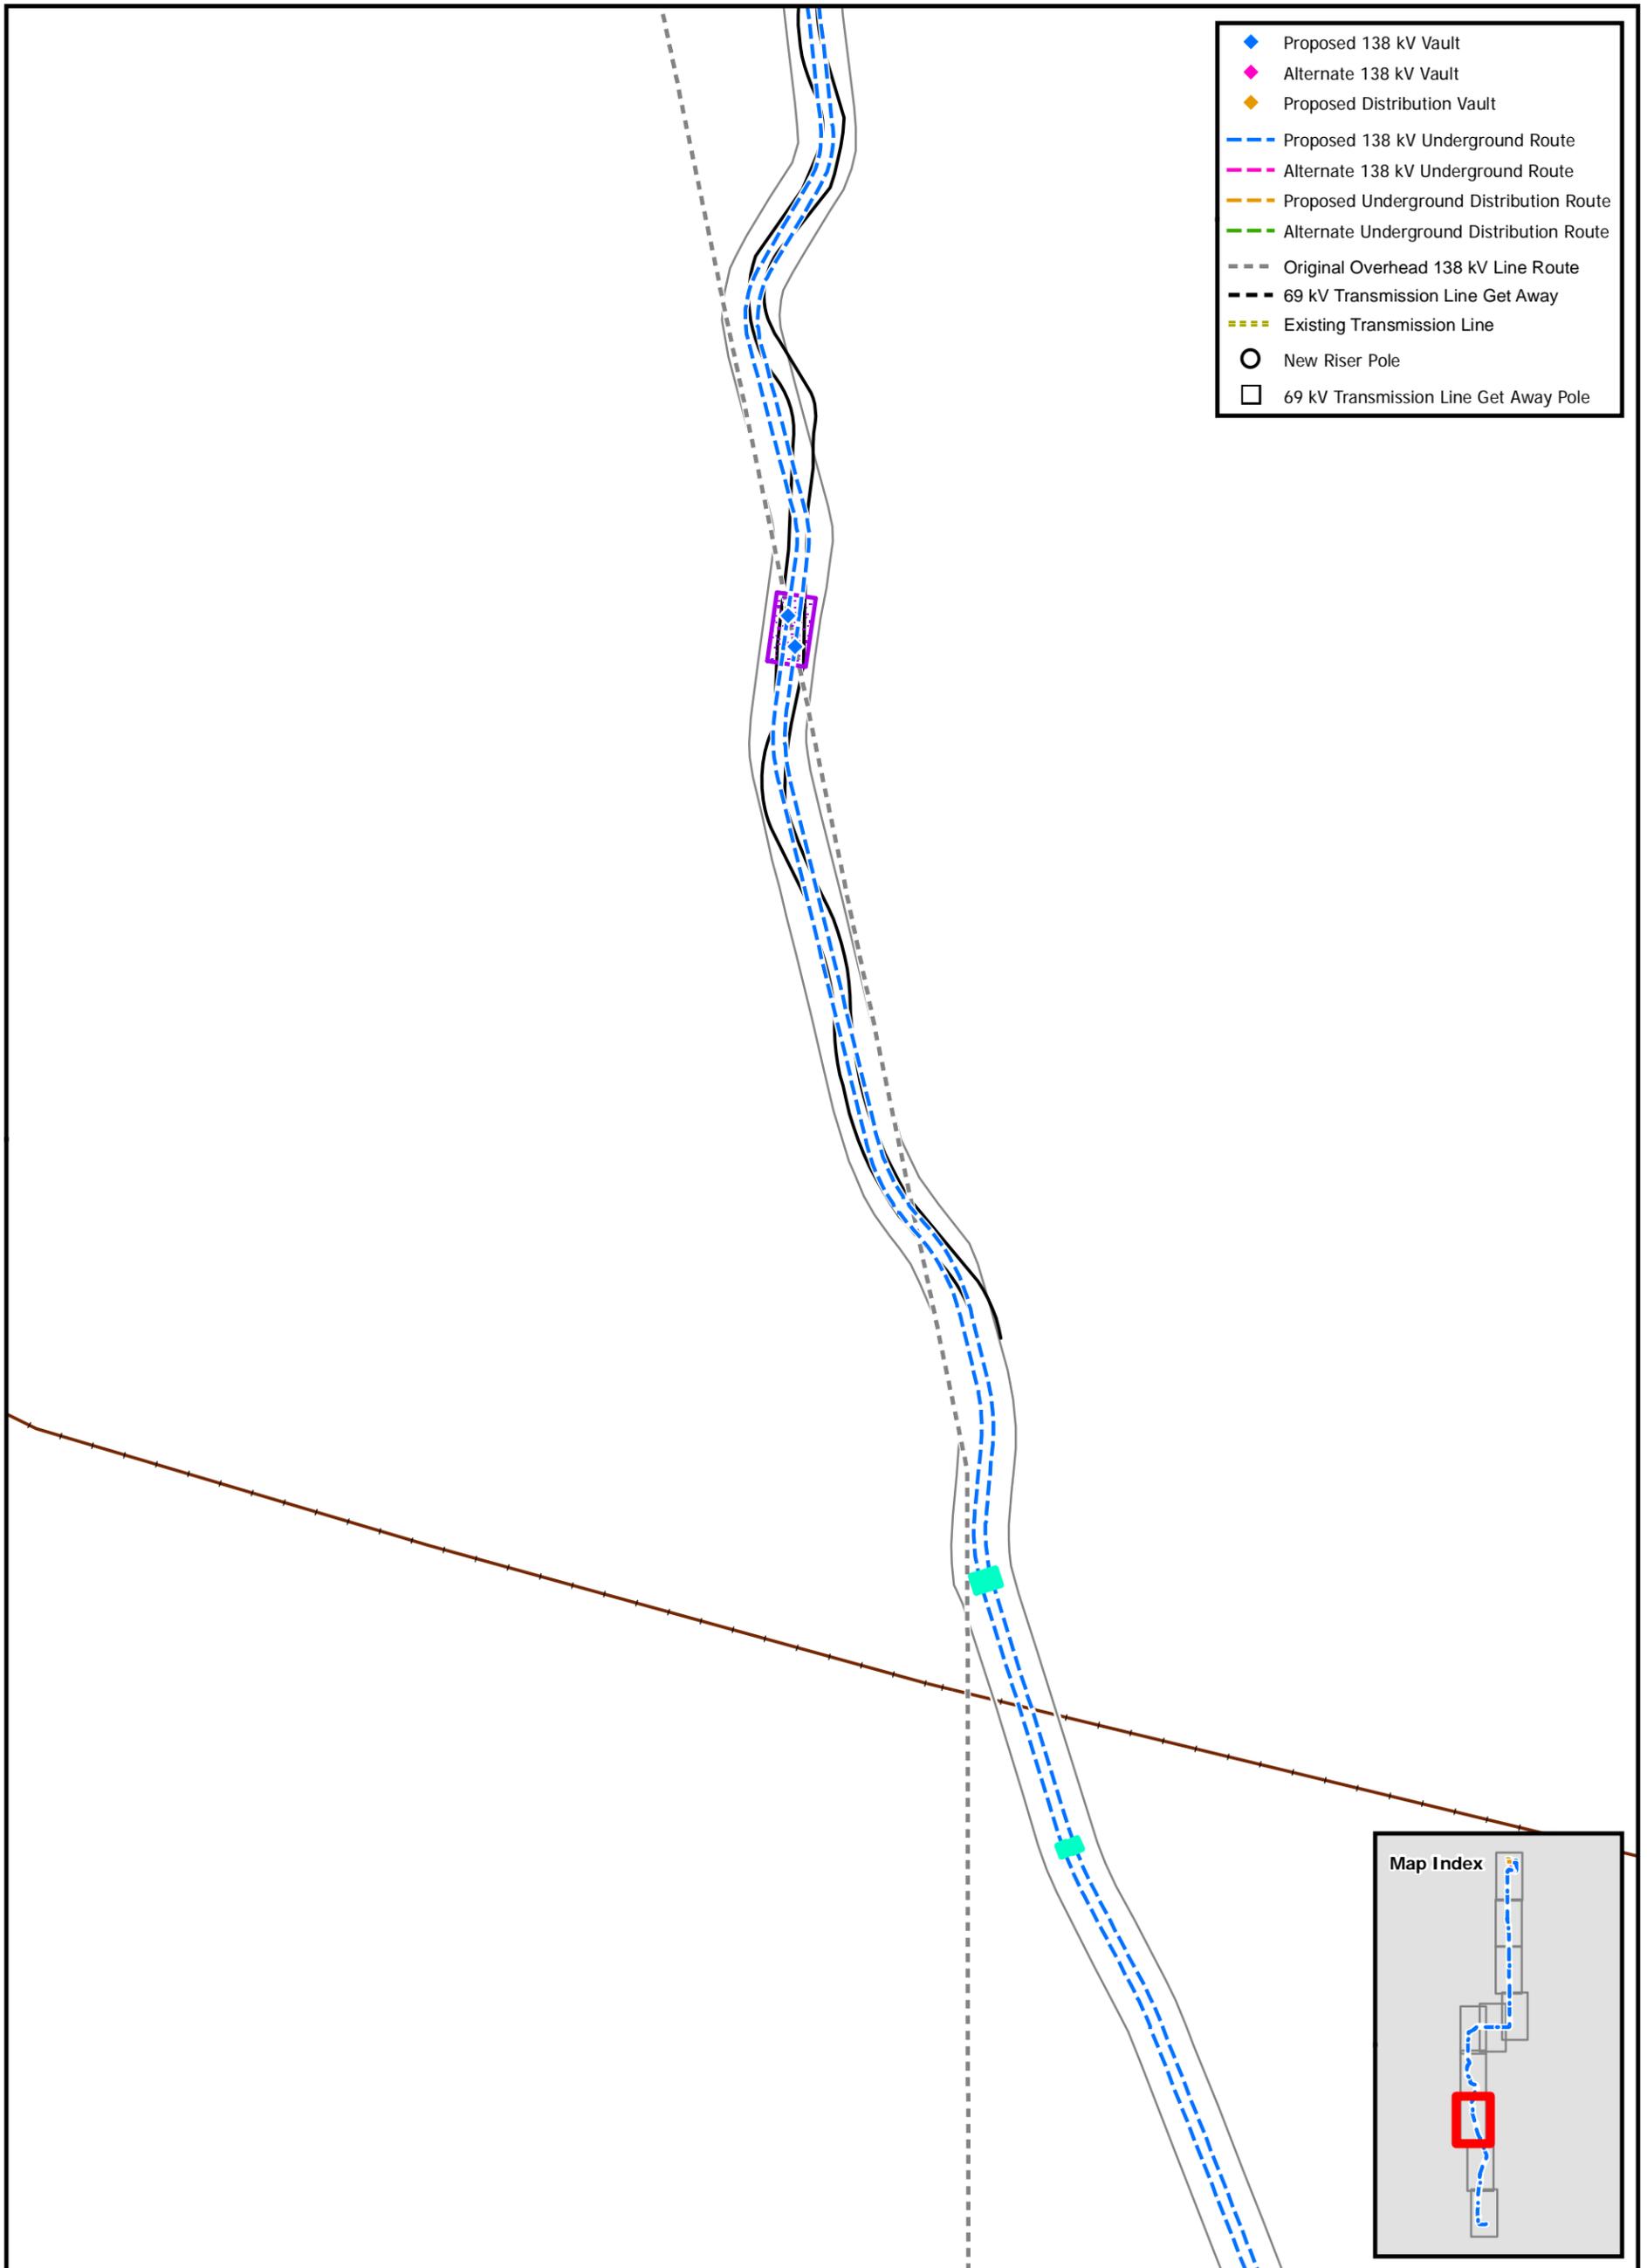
Preliminary Underground Alignment Drawing 8 of 10
